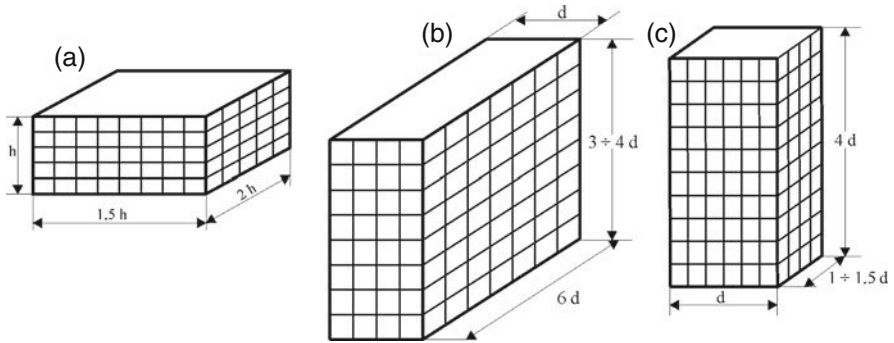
Rectangular prismatic foundations of various dimensions
